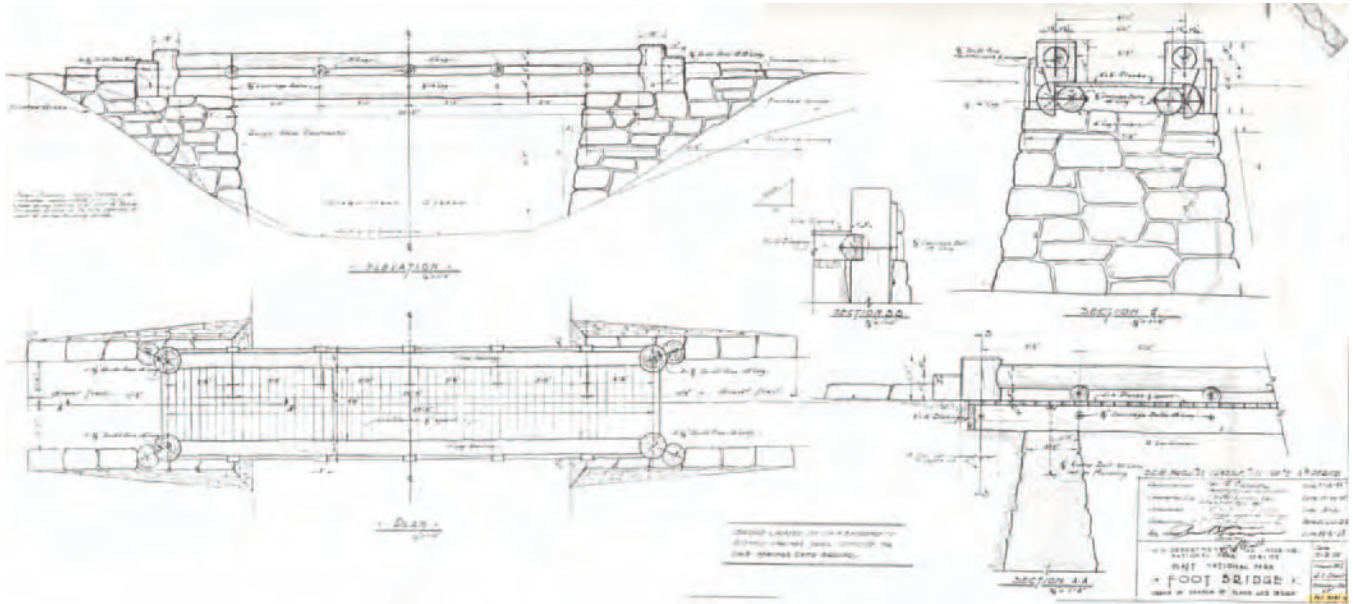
"Foot Bridge," Drawing NP-PLA-5041, 1935. This bridge was proposed for crossing at Cold Springs Camp to connect to the trail to Buffalo Springs.
